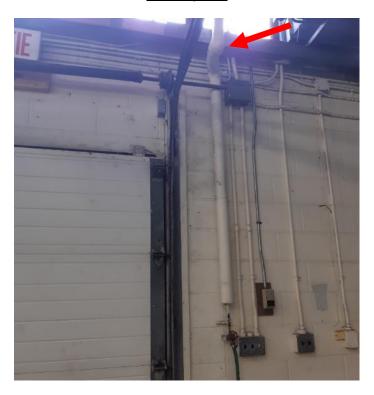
Ground floor, room 1, on east wall south of bay doors, 1 fair condition fitting.
